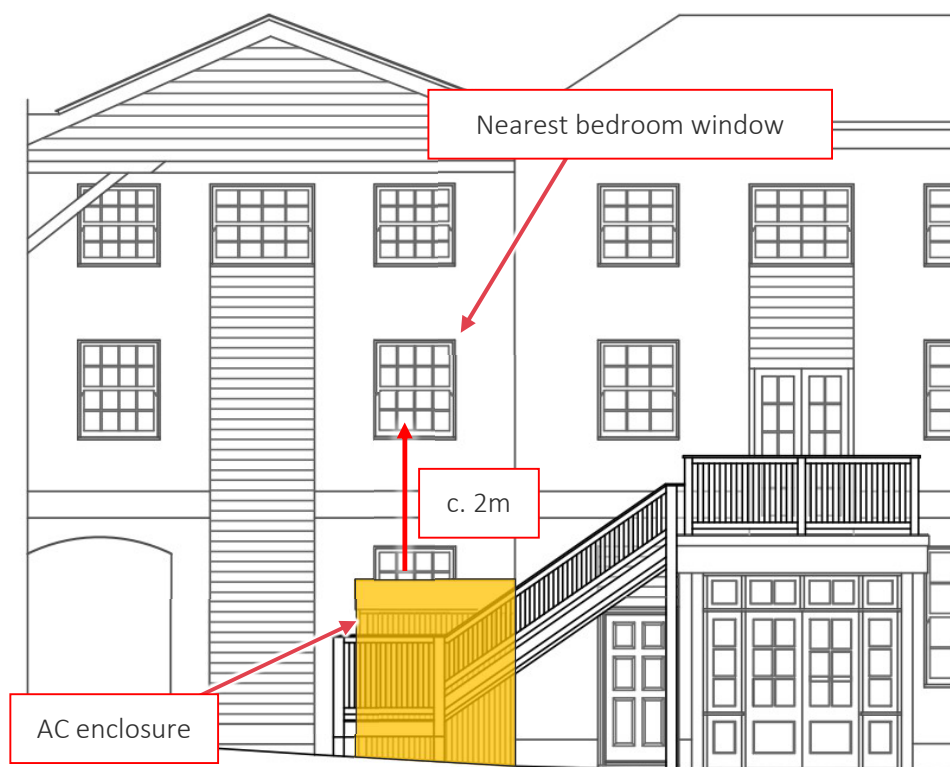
Elevation showing proposed location of AC enclosure in proximity to guest bedrooms
